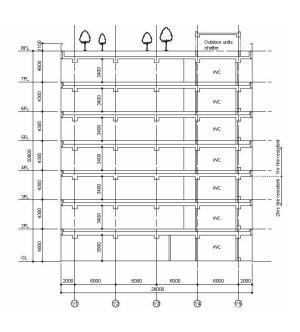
h - Section; Dimensions in [mm]
